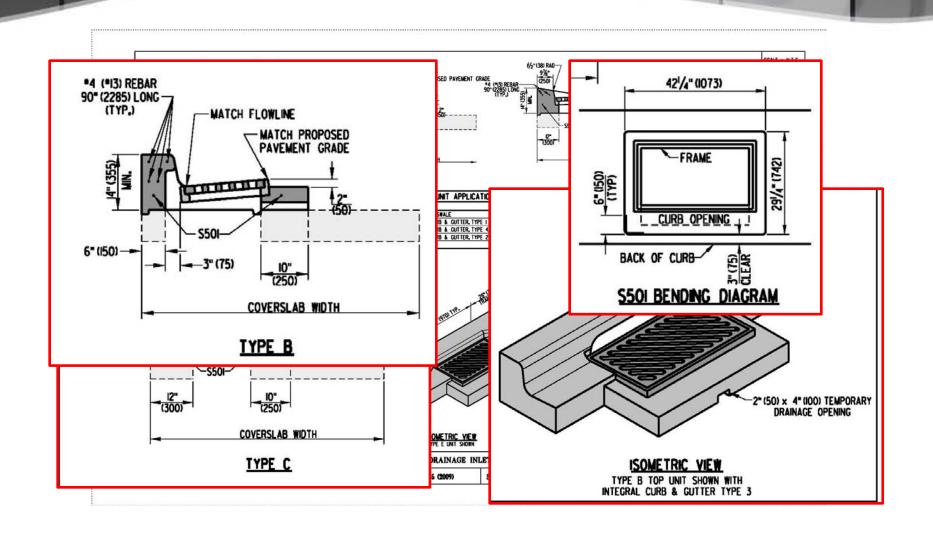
, Sheet 1 of 1 – Inlet Box Details
